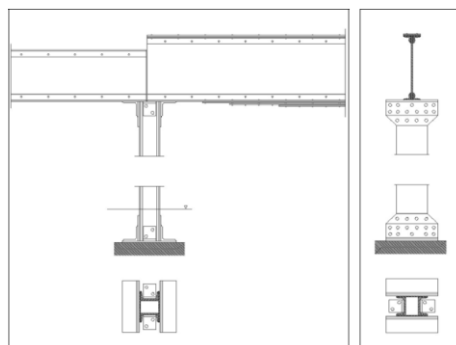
Detail of connection between riveted beam and column profiles (Paricio Casademunt, 2001).
